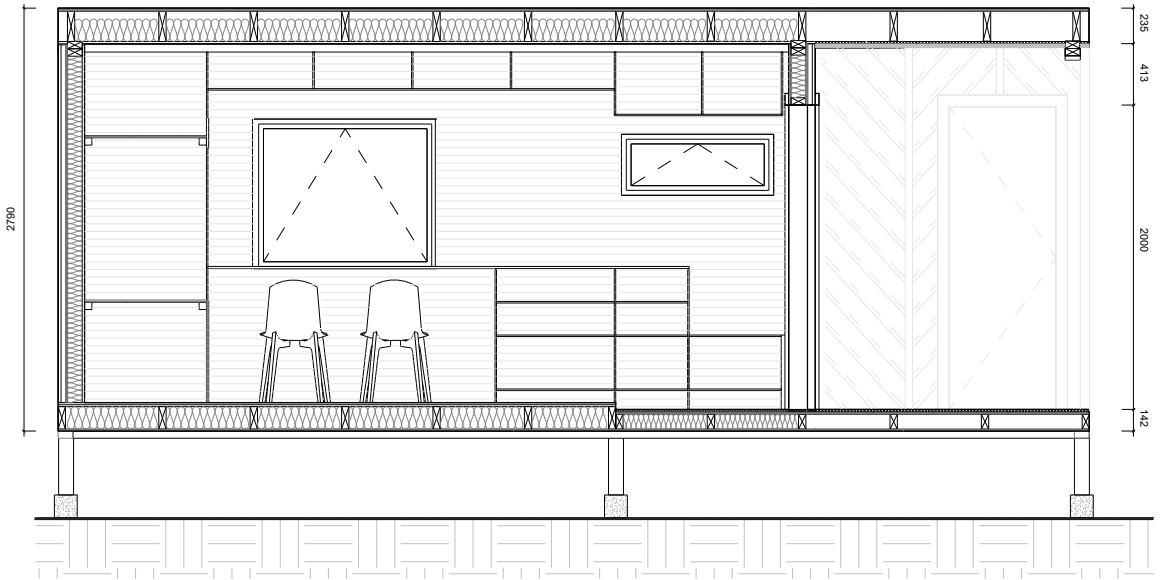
SECTION B-B PRIOR TO THE BUILT. SCALE 1:50
